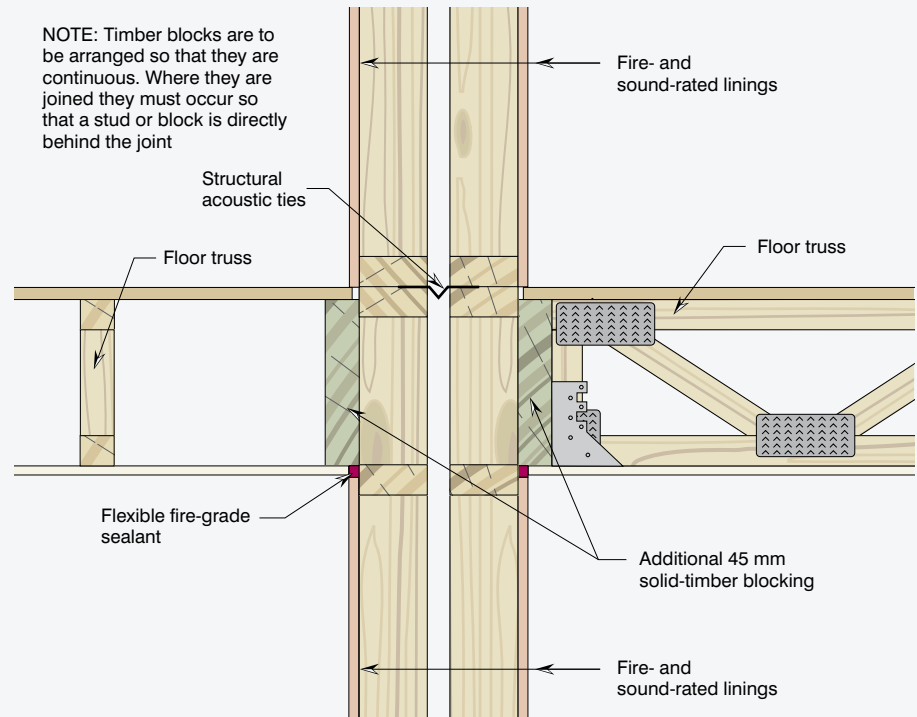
Joist parallel and perpendicular to the wall, wall stud continuous through junction – FRL 60 minutes only – elevation view.
